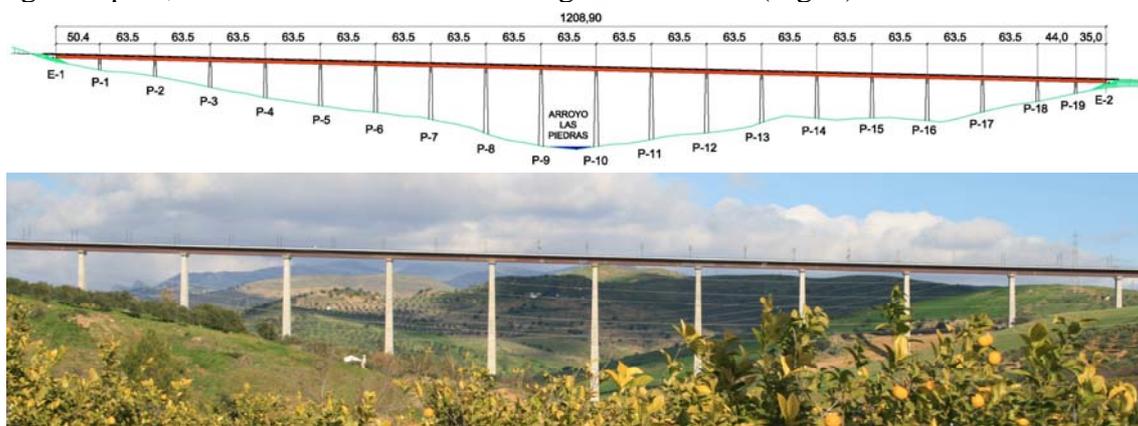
Elevation view of “Arroyo las Piedras” viaduct.
